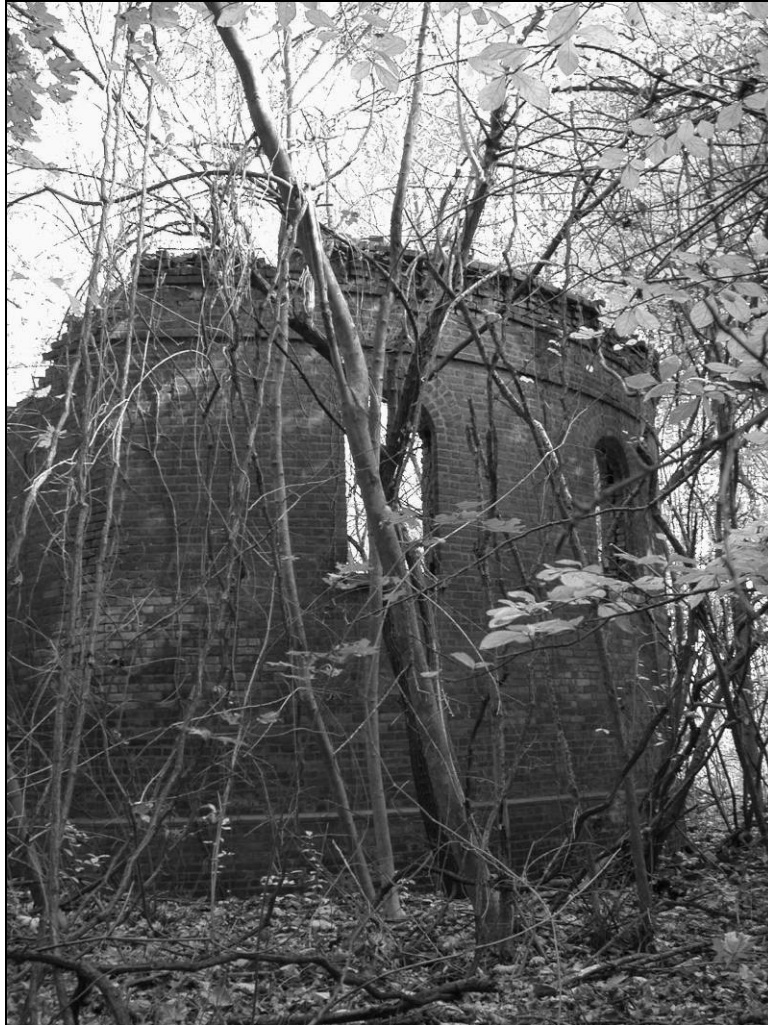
Southern end of south wing (left) with connected south dormitory dependency (right), facing west.
